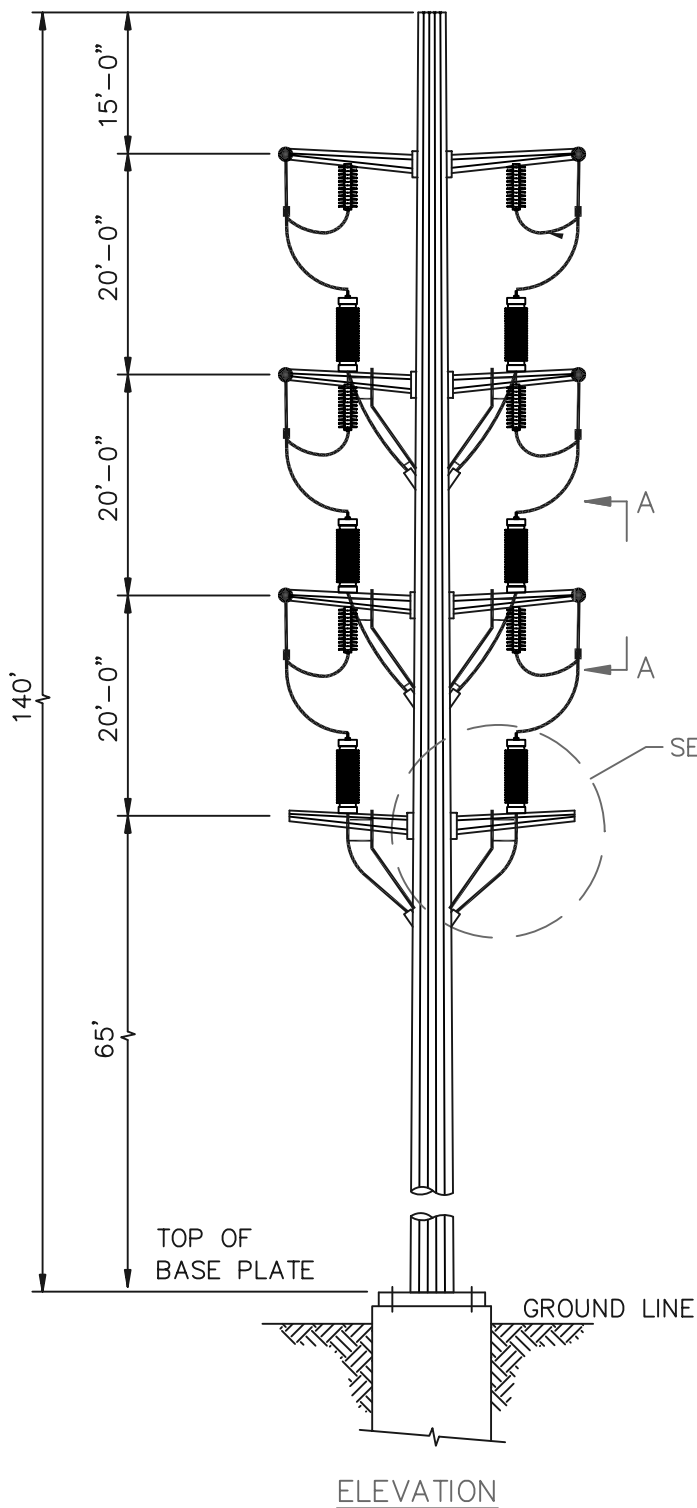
Steel Cable Riser Pole Typical Drawing
